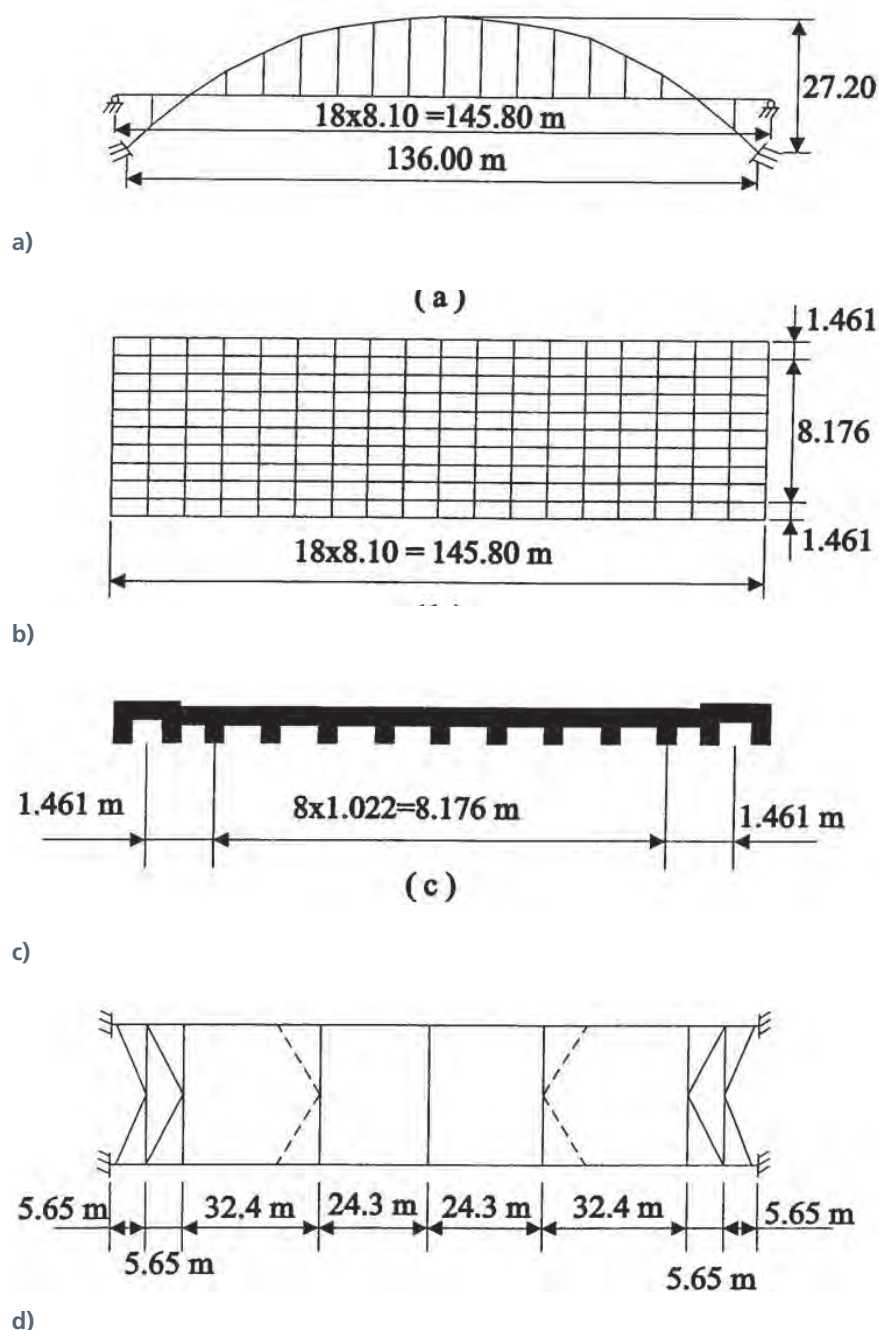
Dimensions of Shitanxi Bridge, (a) Elevation, (b) Deck Plan, (c) Cross-section, (d) Arch Plan
